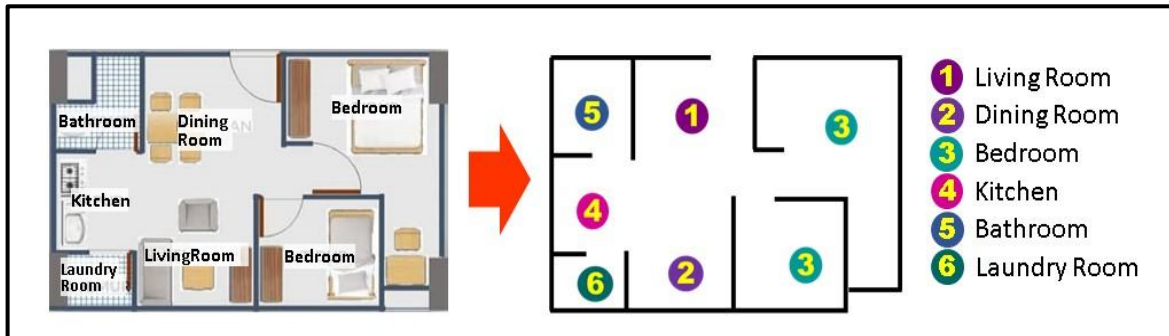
Example of a flat residential unit layout (left) and its redrawn layout (right)
